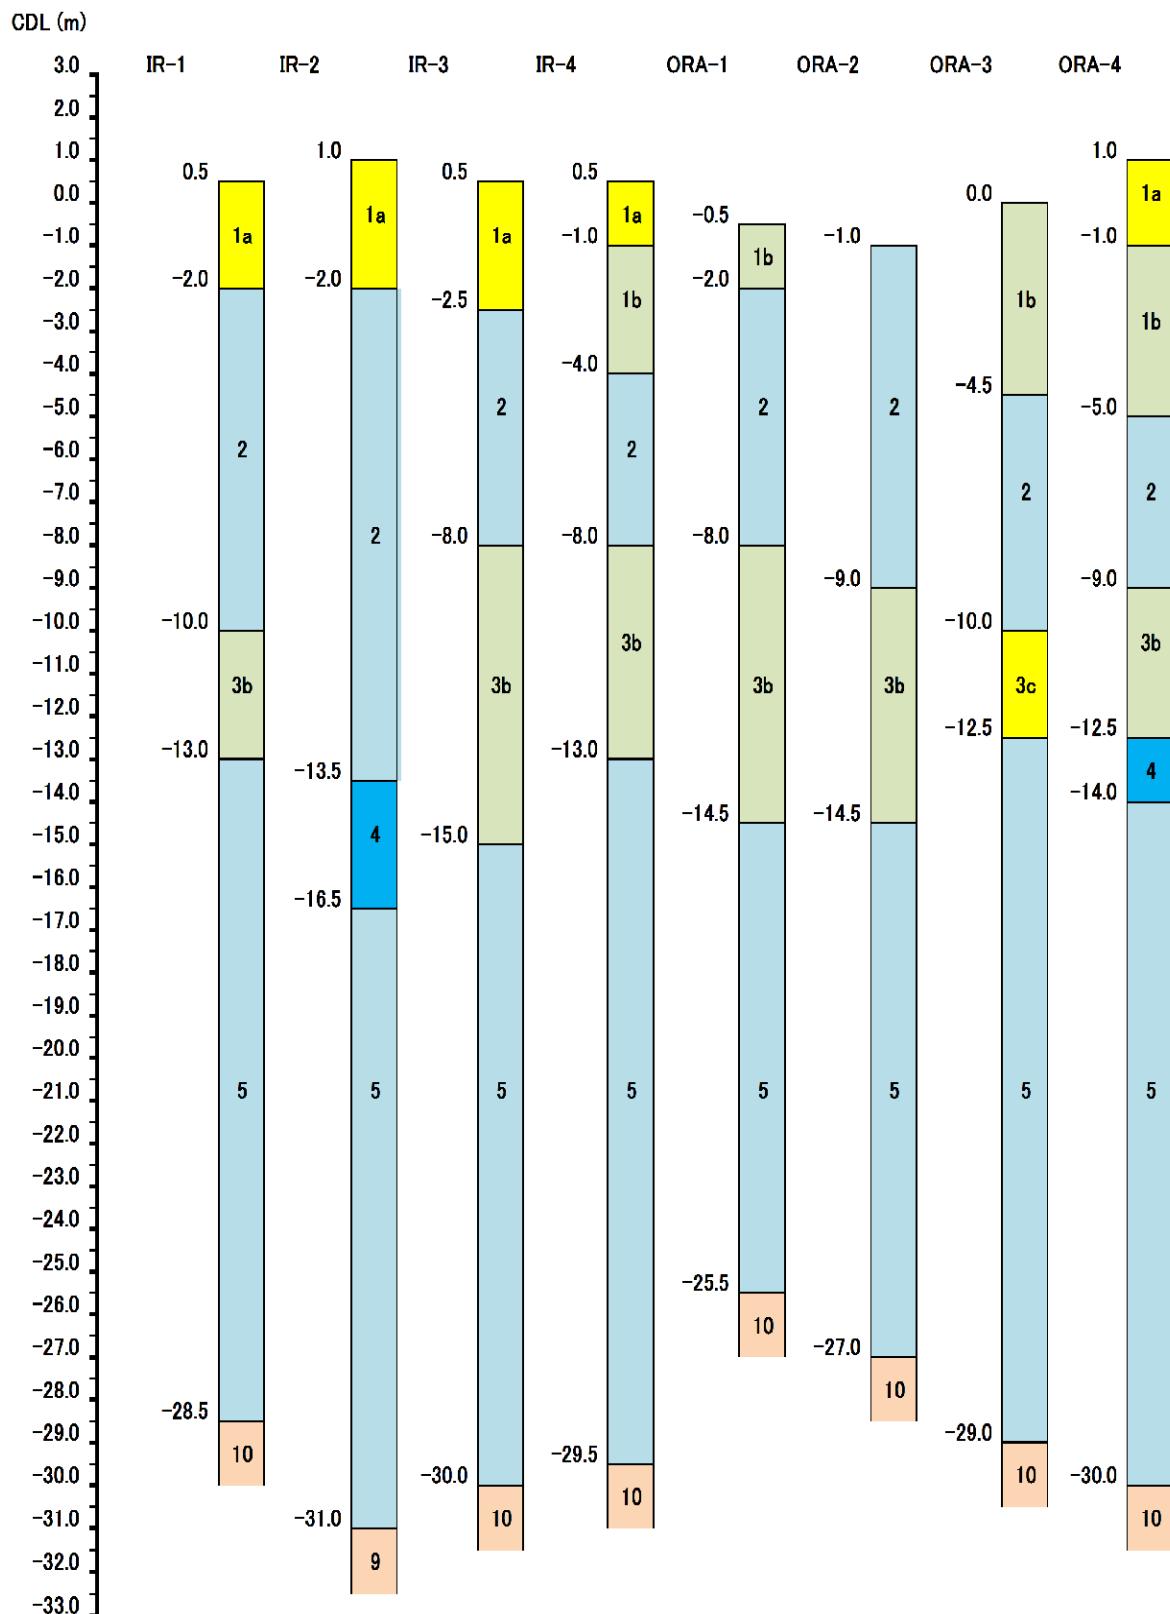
Soil layer models for subsoil improvement design for Inner Revetment and Outer Revetment A
